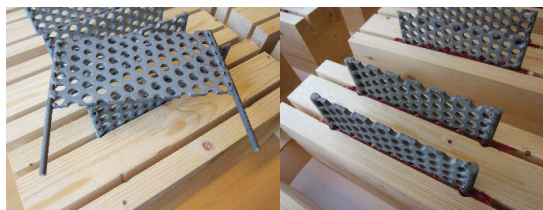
Gluing of shear test specimens with plate+rods arrangement.
